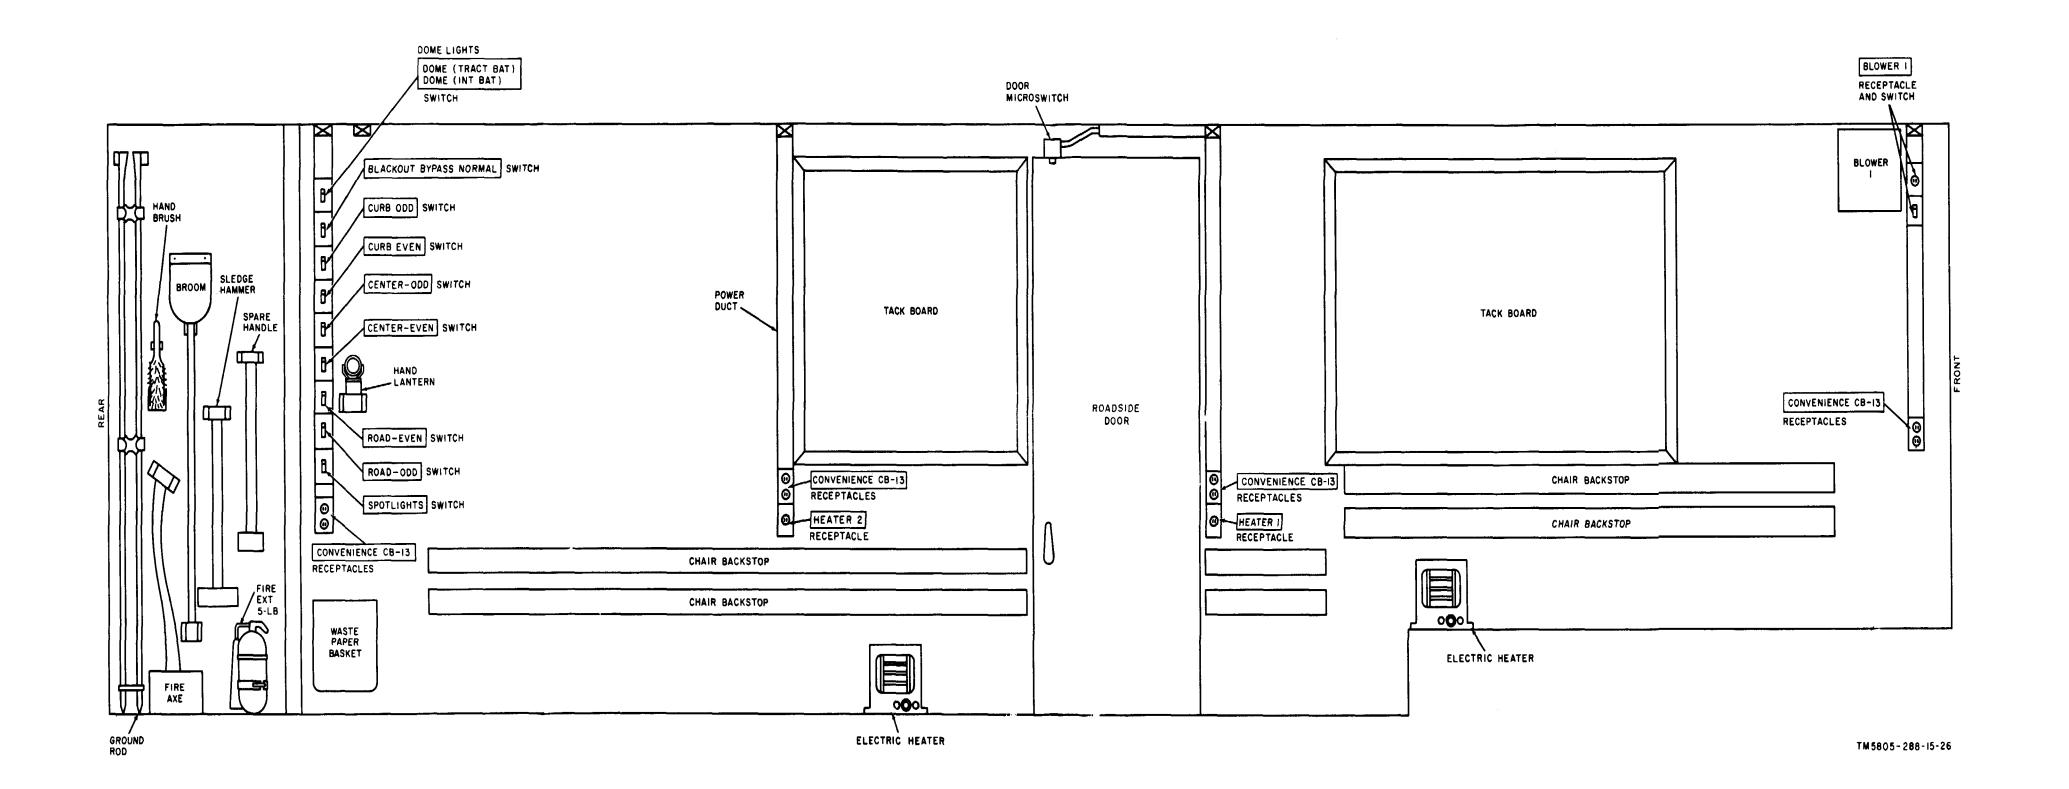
Telephone Switchboard Group AN/MTA-7, roadside wall, elevation diagram.
